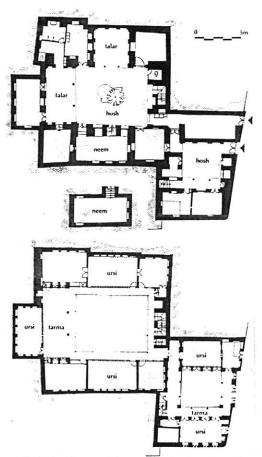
Ground floor plan, basement and first floor plan, kadhimiyeh.
